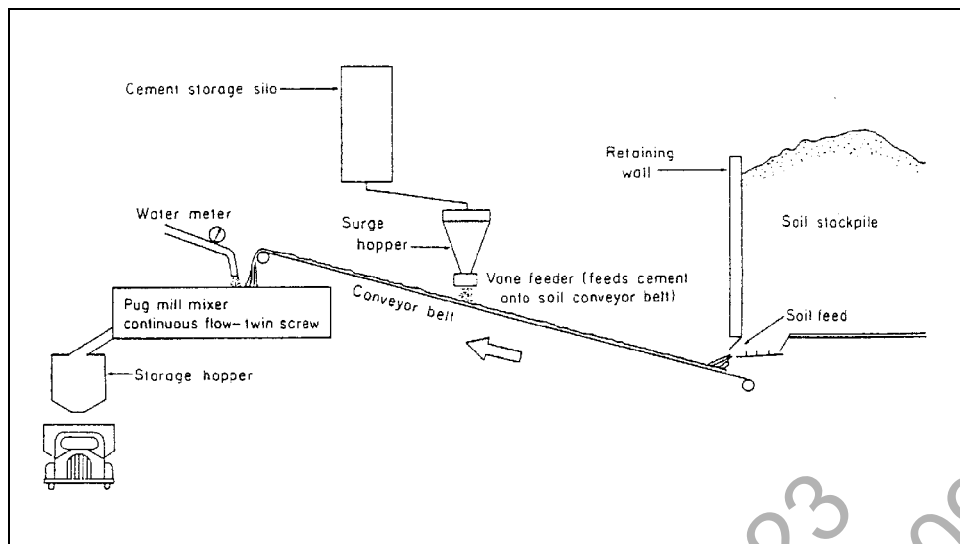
Schematic of continuous flow mixing plant for soil cement.⁽⁷⁾
